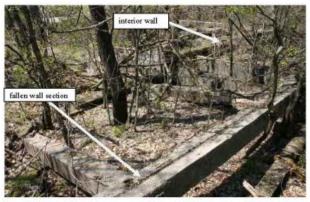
St. Mary's of the Quapaw school, Building 2 (1915 Dormitory Building), view northwest of fallen wall section and interior floor support walls.
